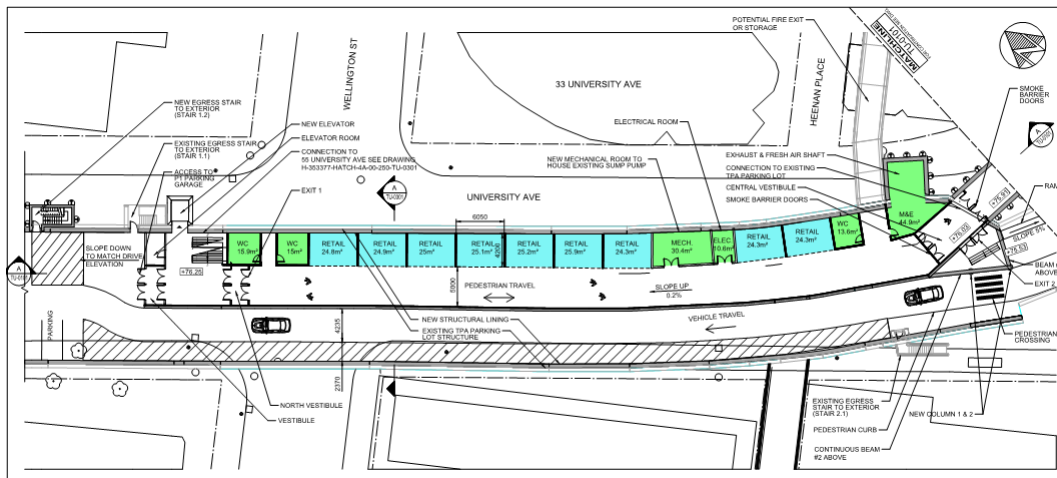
Plan view of the north section of the new NW PATH tunnel, connecting to Phase 1. Drawing courtesy of Hatch.
